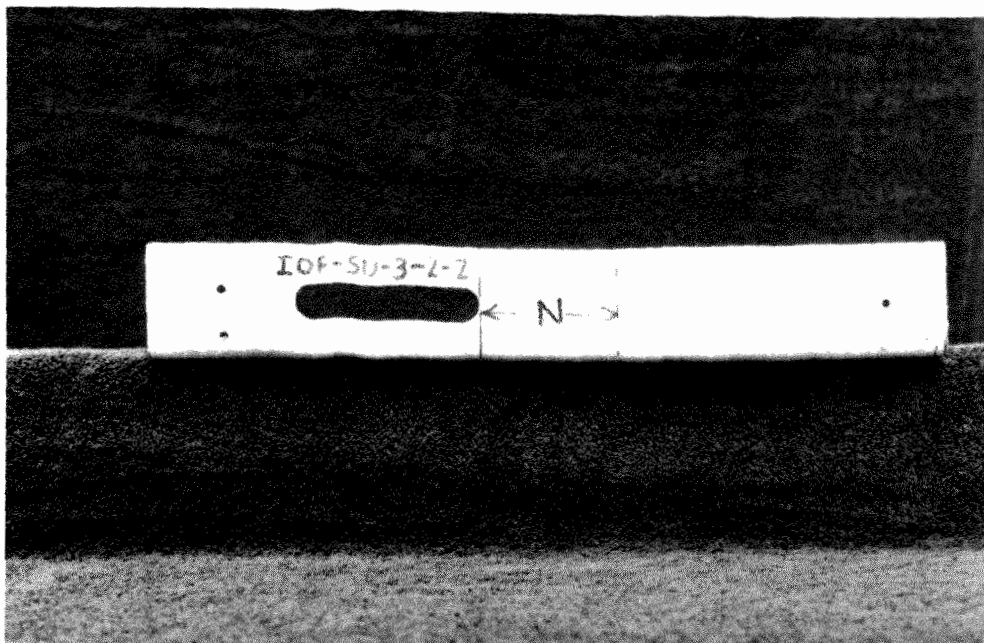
Typical Unreinforced IOF Web Crippling Failure, IOF-SU-3-2-2
